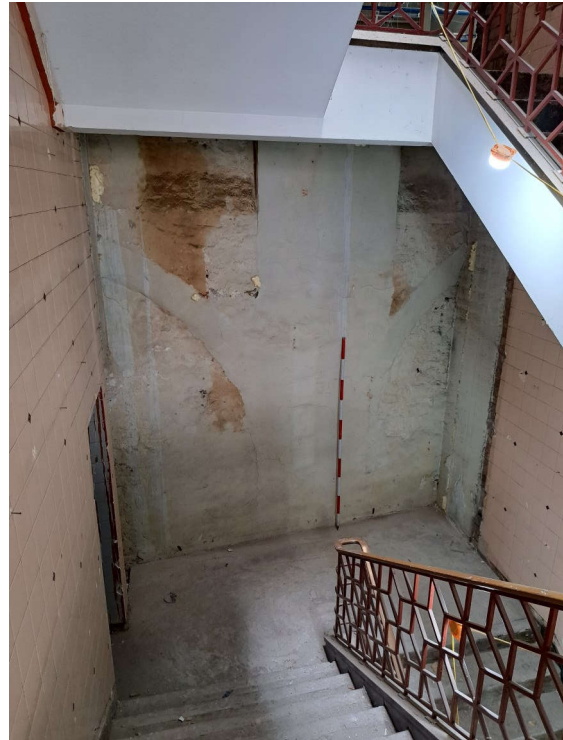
Brick head arches in southern stairway of Building 4. Taken between lower ground floor and first floor. 1 x 2m scale
